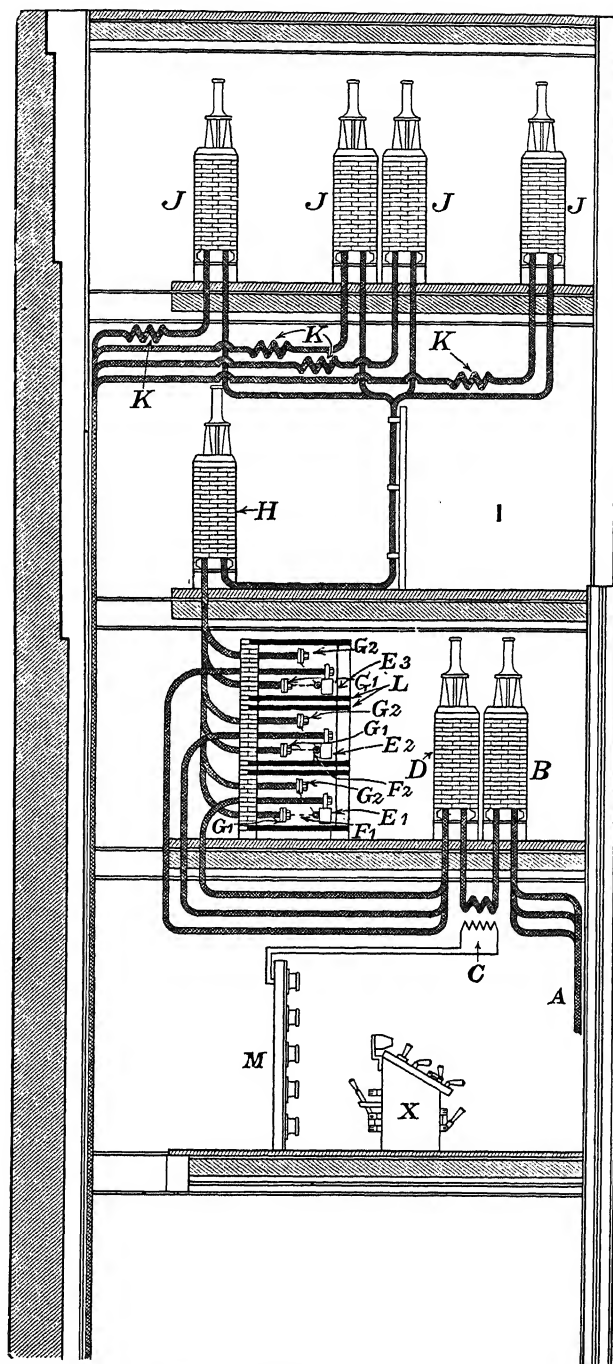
Section showing general arrangement of American keyboard switchgear.
